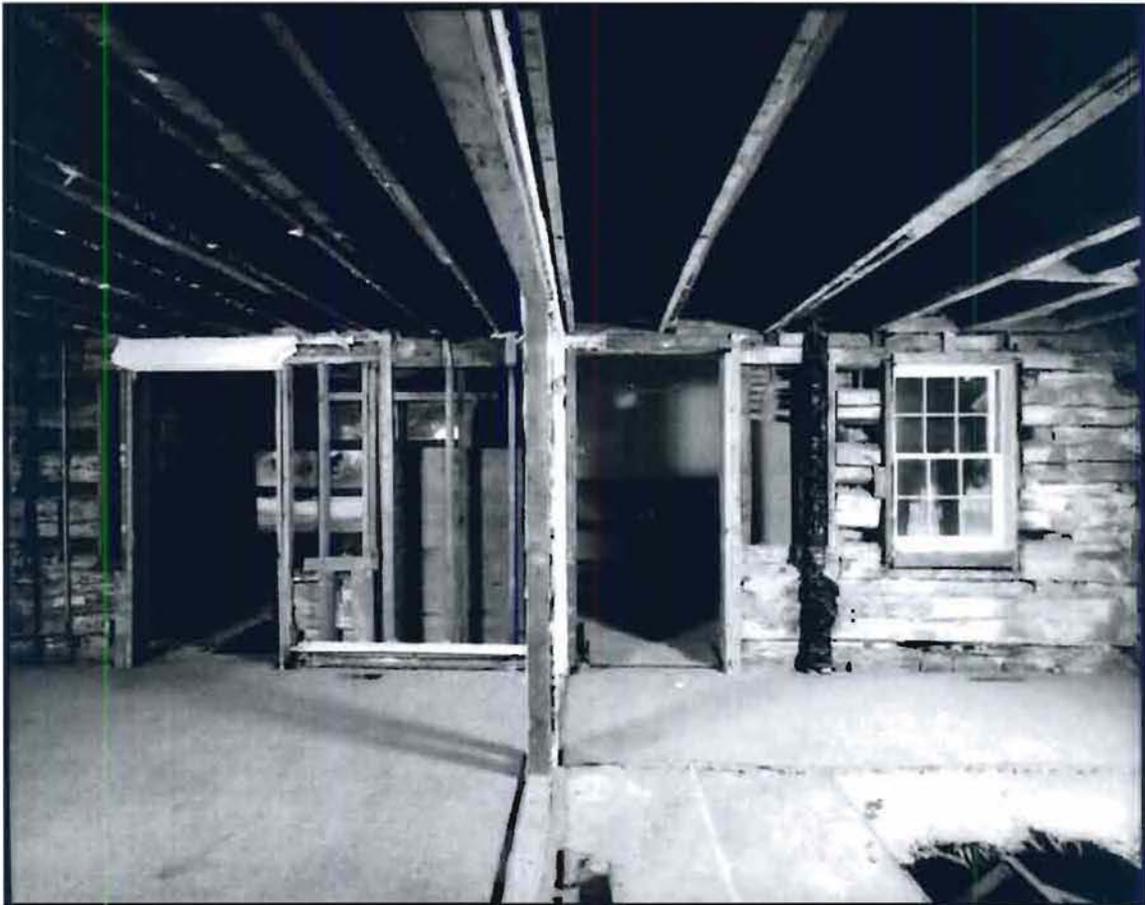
Interior view of east wall, Rooms 101 and 102. Room 102 at left. Twentieth century interior room partition at center of view (Photographer: Dawn Turner, December 1999)[HRI Neg.# 99037/31:1].
